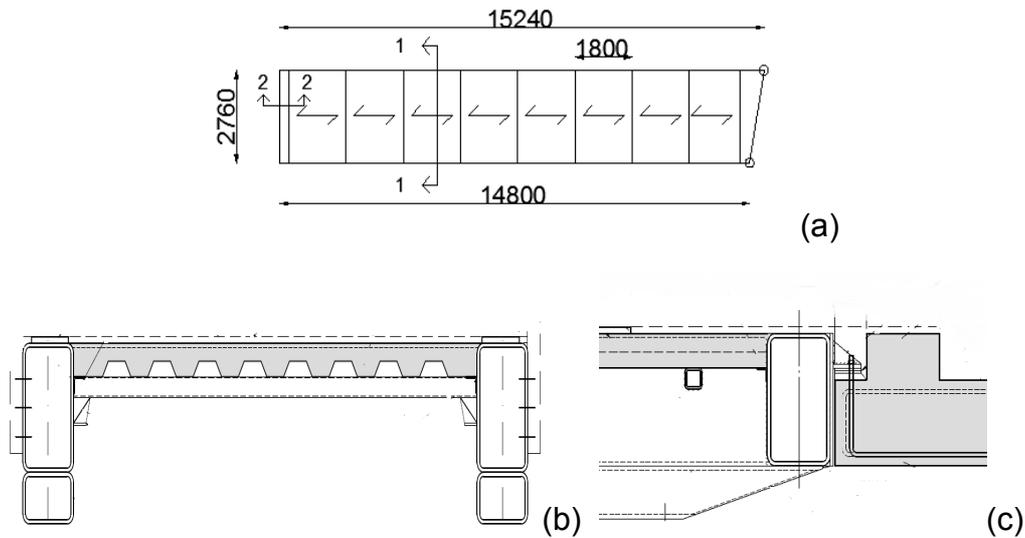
(a) Plan view, (b) Section 1-1, (c) Section 2-2
